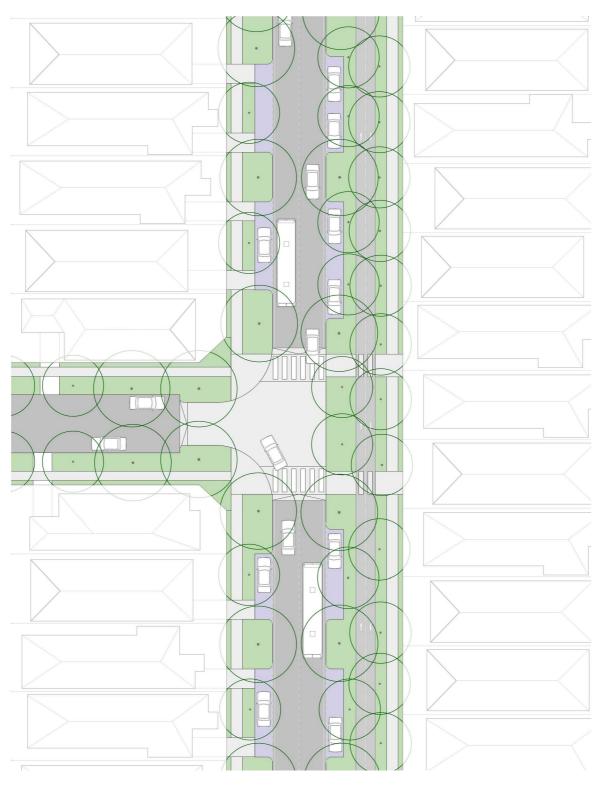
Indicative connector street plan (1:200 @A4 scale)
